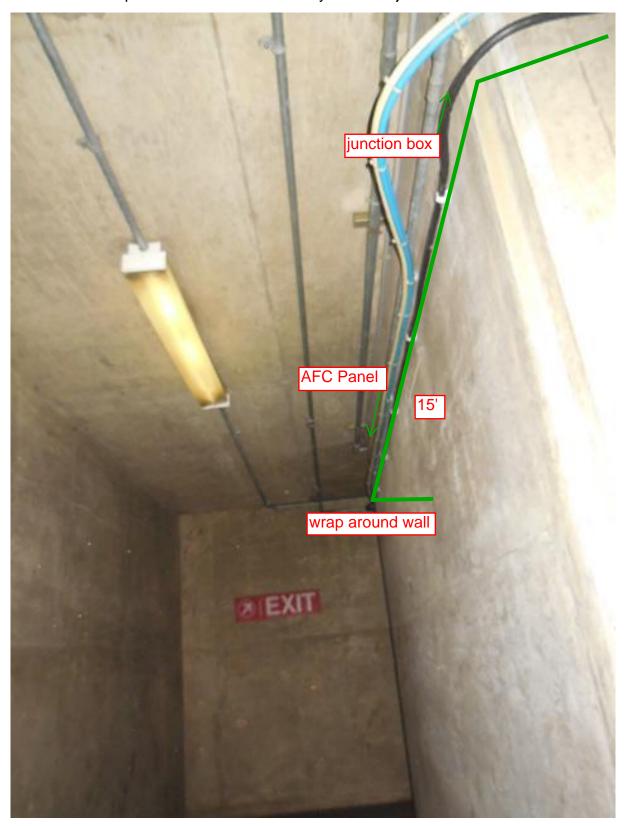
Proposed conduit run in hallway between junction box and Room C101
